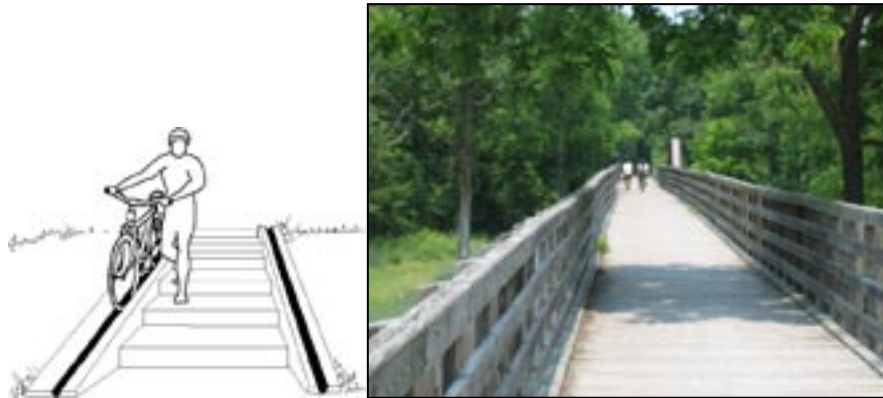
Bicycle wheel gutters on stairs and boardwalk bridge
